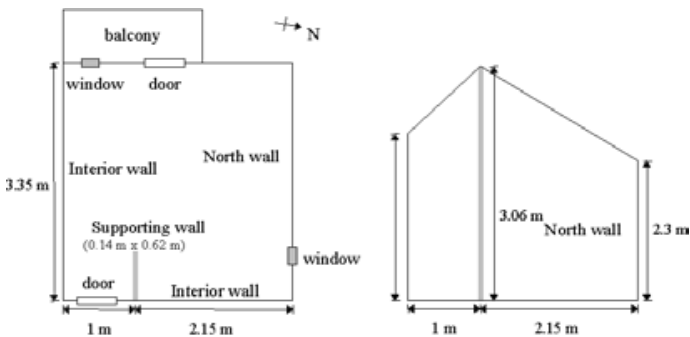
Plan and vertical section of the test room in the Tapanila ecological house.
